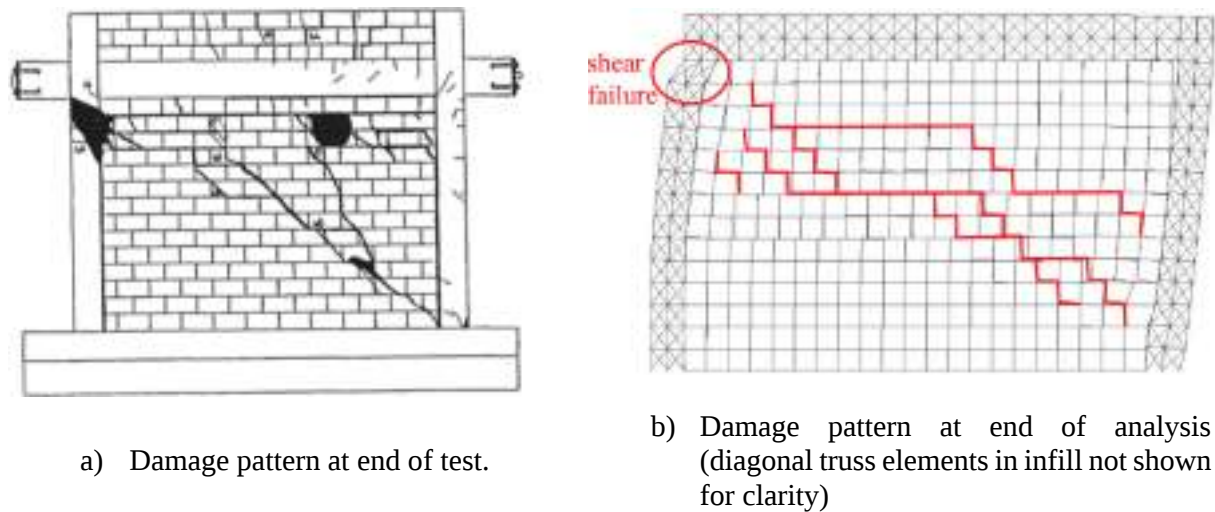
Damage pattern for specimen with strong infill wall tested by Mehrabi et al. [36].
